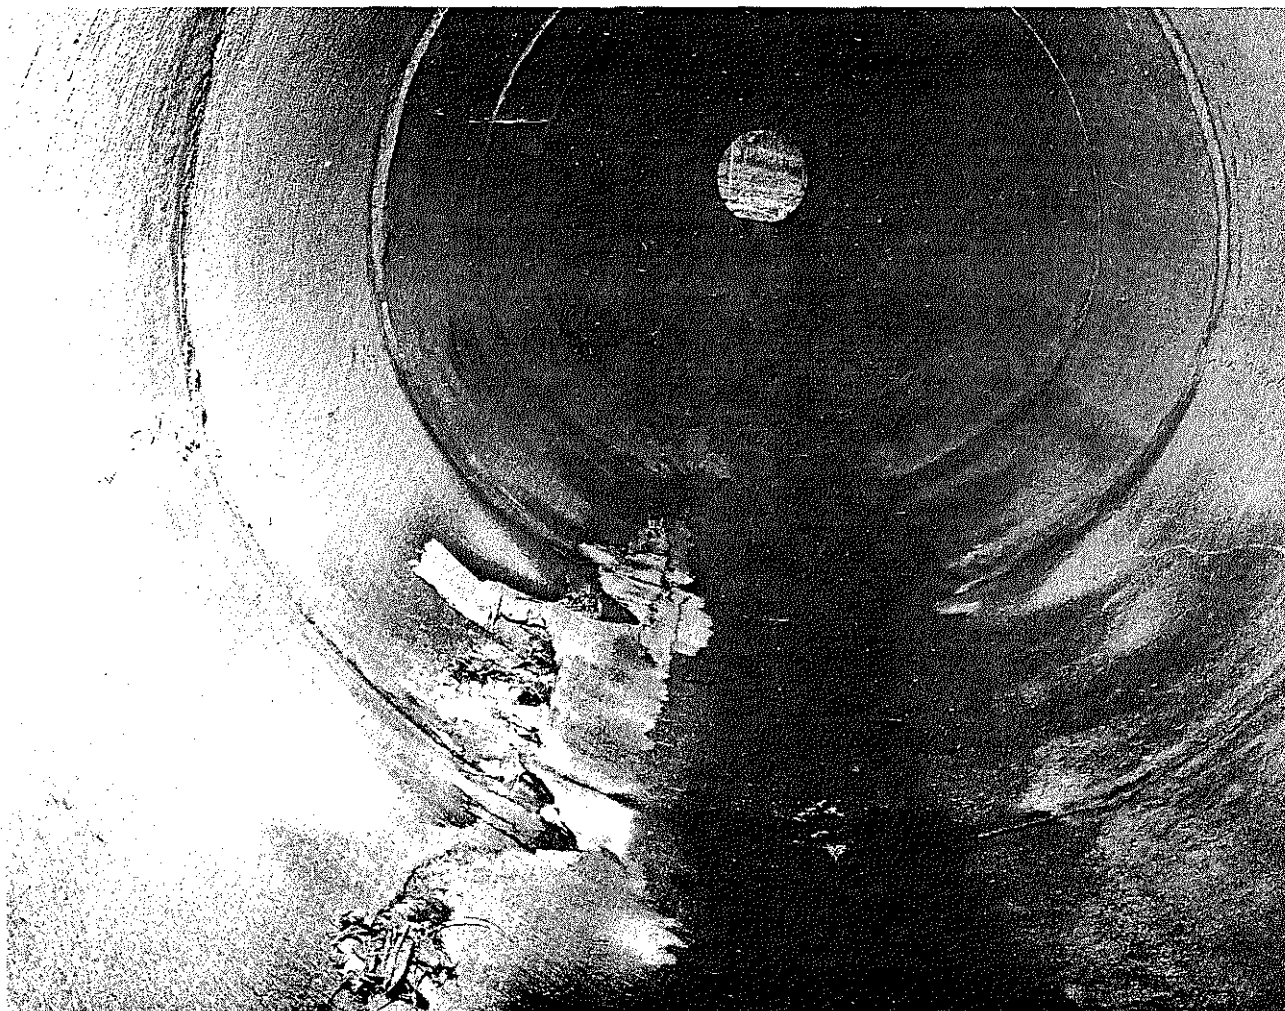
Failure in Bottom of 60-inch Culvert Under a 28-foot Fill, Station 1619 + 45L, I 64-3(7)35, Shelby County.
